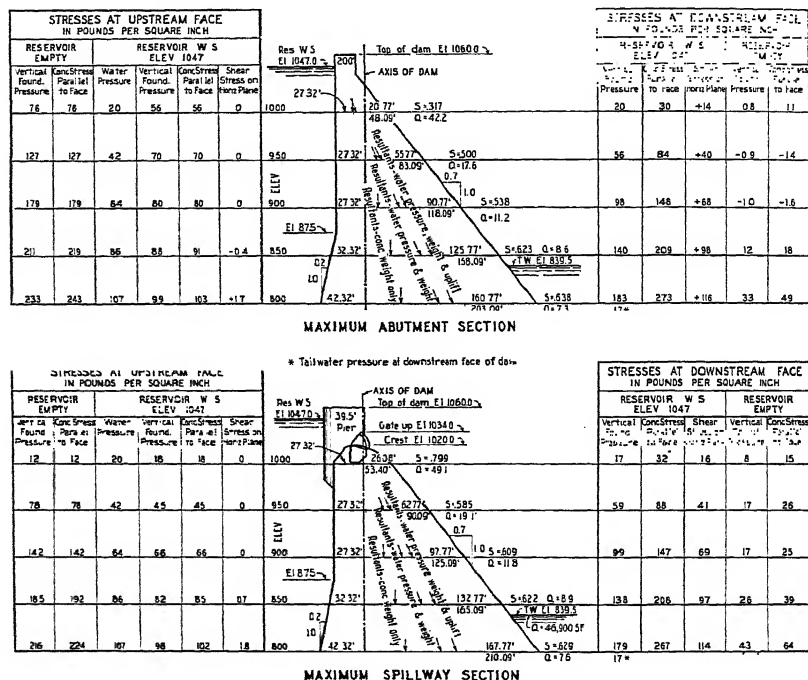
Gravity analysis—Reservoir elevation 1,047.
